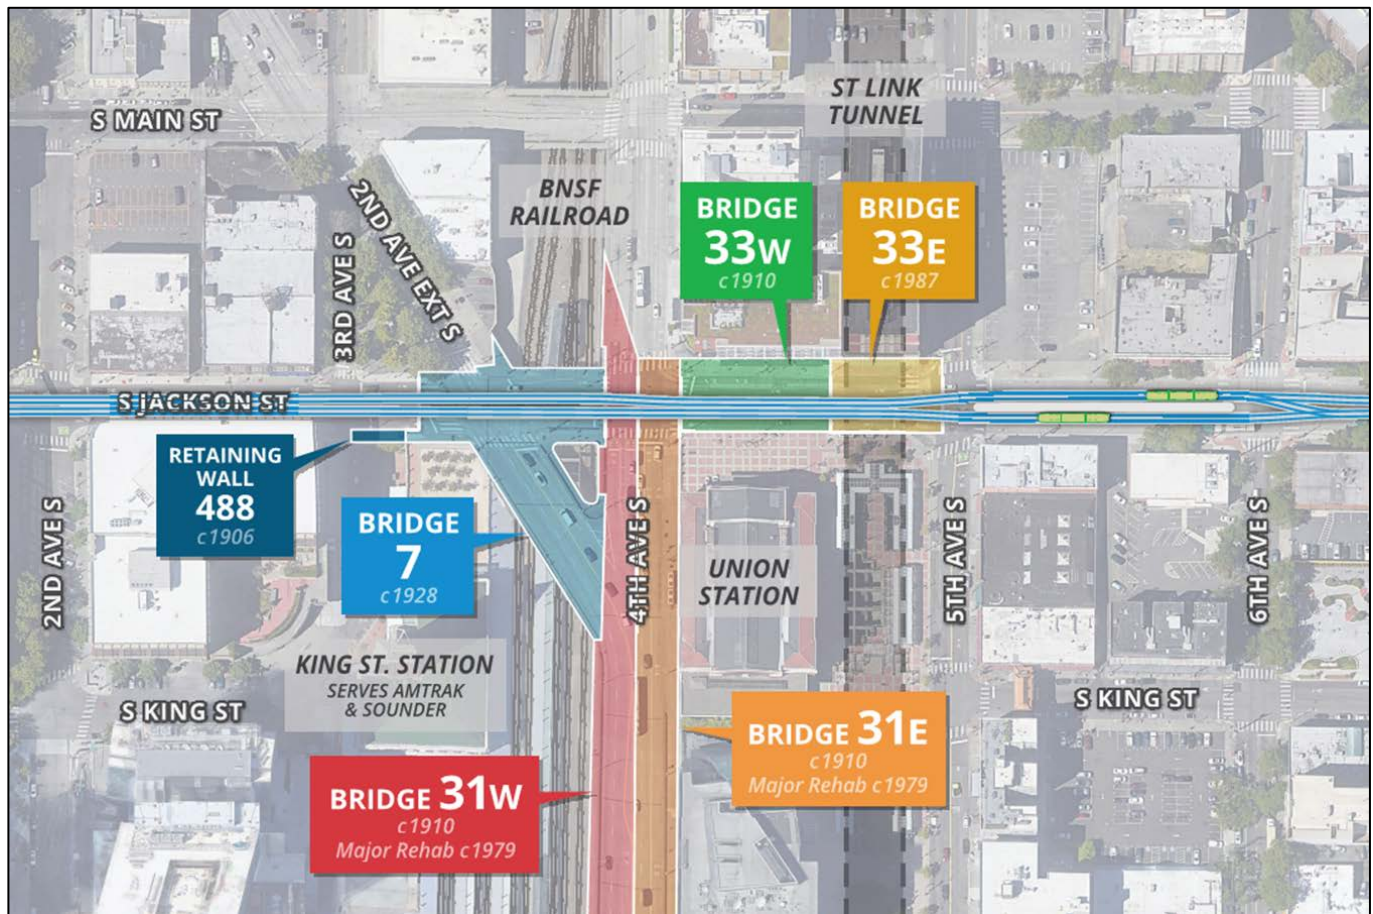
Five bridge structures of various vintages support the S Jackson Street roadway and streetcar tracks between 2nd Ave Extension S and 5th Avenue S.
